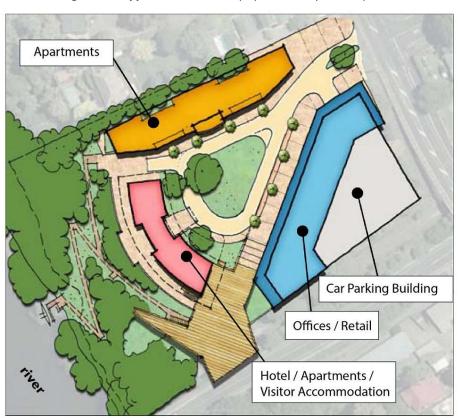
y: Indicative concept plan for Key Development Site 6
